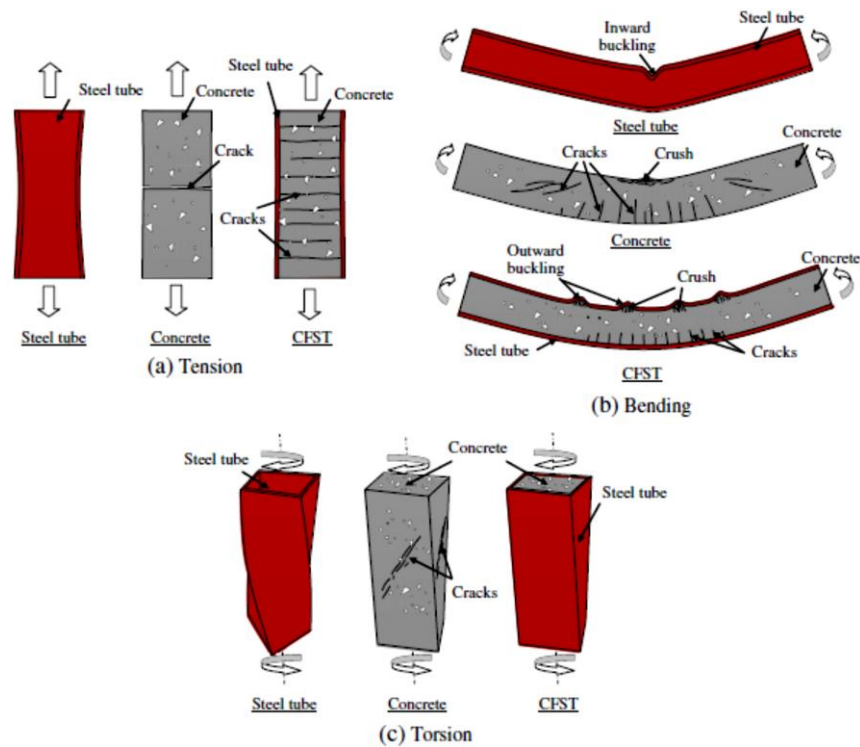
Schematic failure modes of steel tube, concrete and CFST under tension, bending and torsion (Han et al., 2014)
